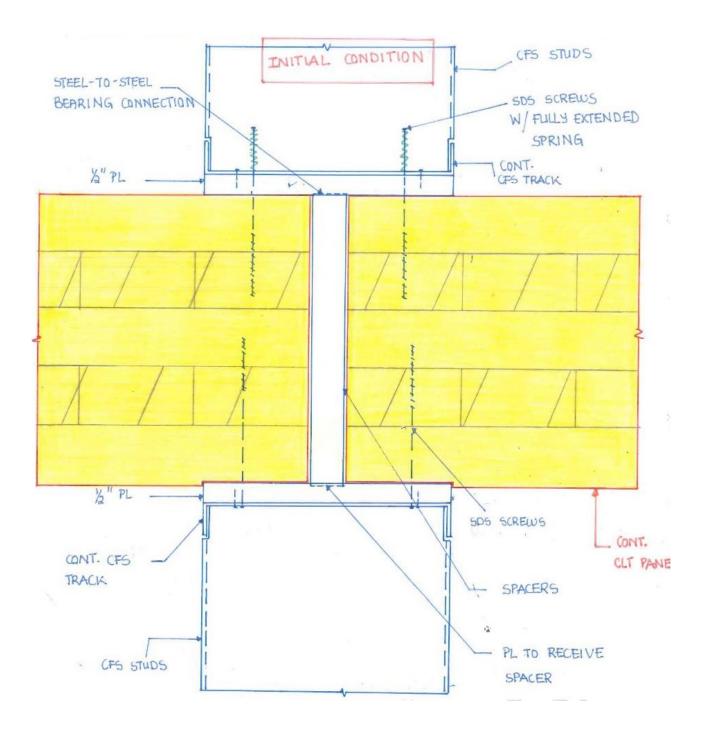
Option 3 - load transfer using precast concrete spacers
